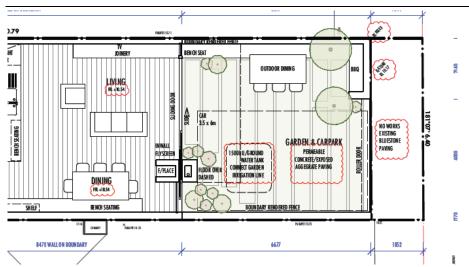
Extract of PLN20/0584 endorsed plans showing ground floor car park and SPOS
